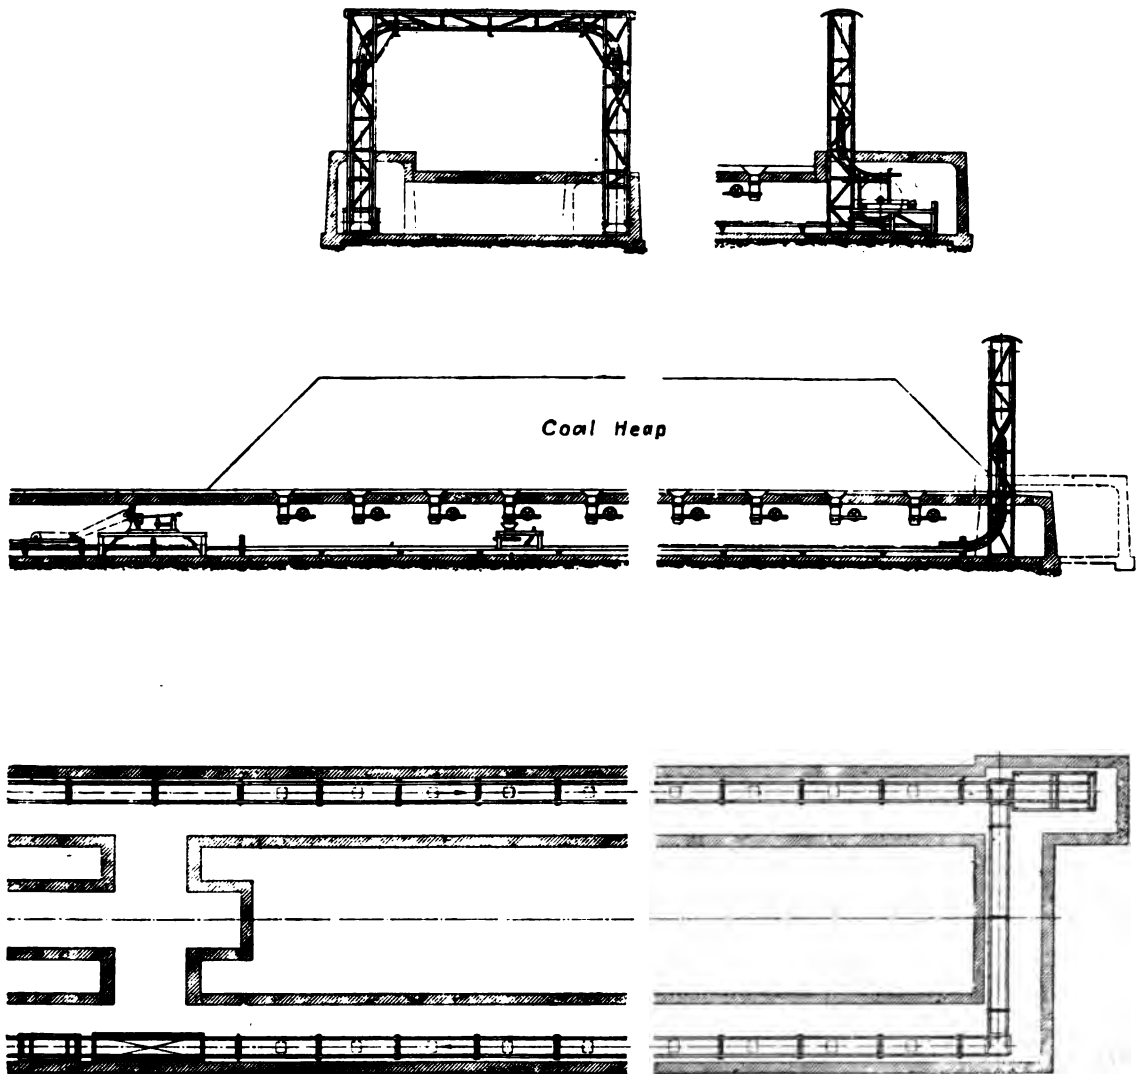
Coal Store. Arrangements for Coal Transport.
